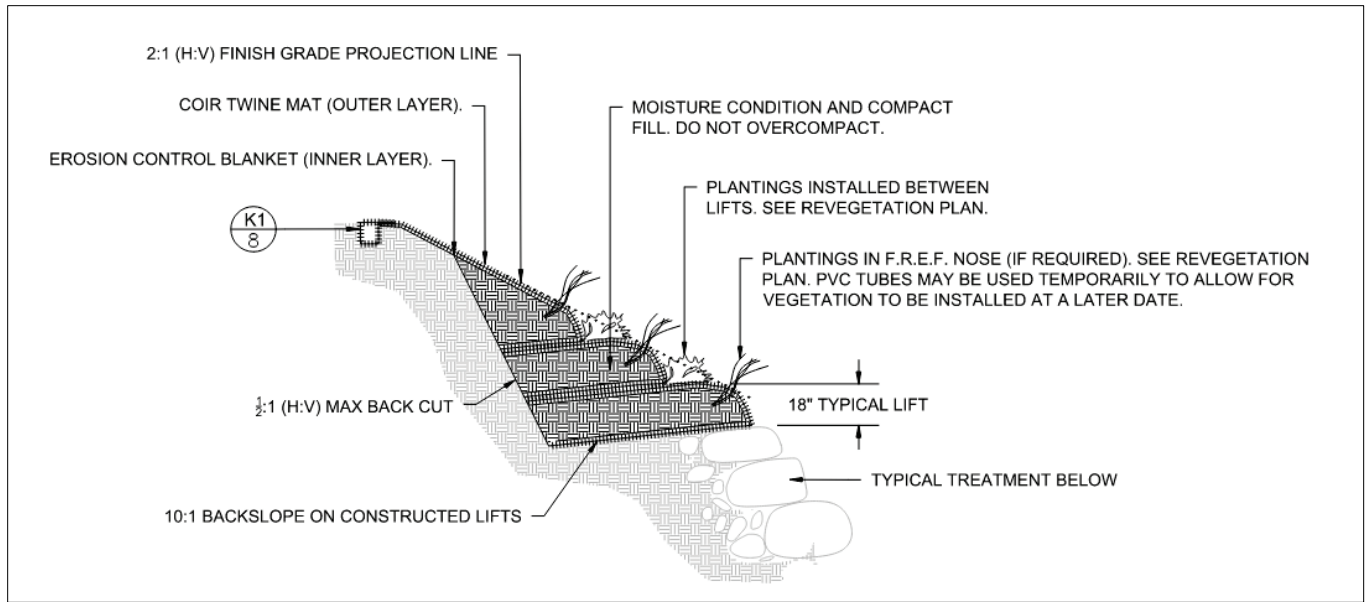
Cross section view of the Kohler Creek bank repair (PCI 2022)
